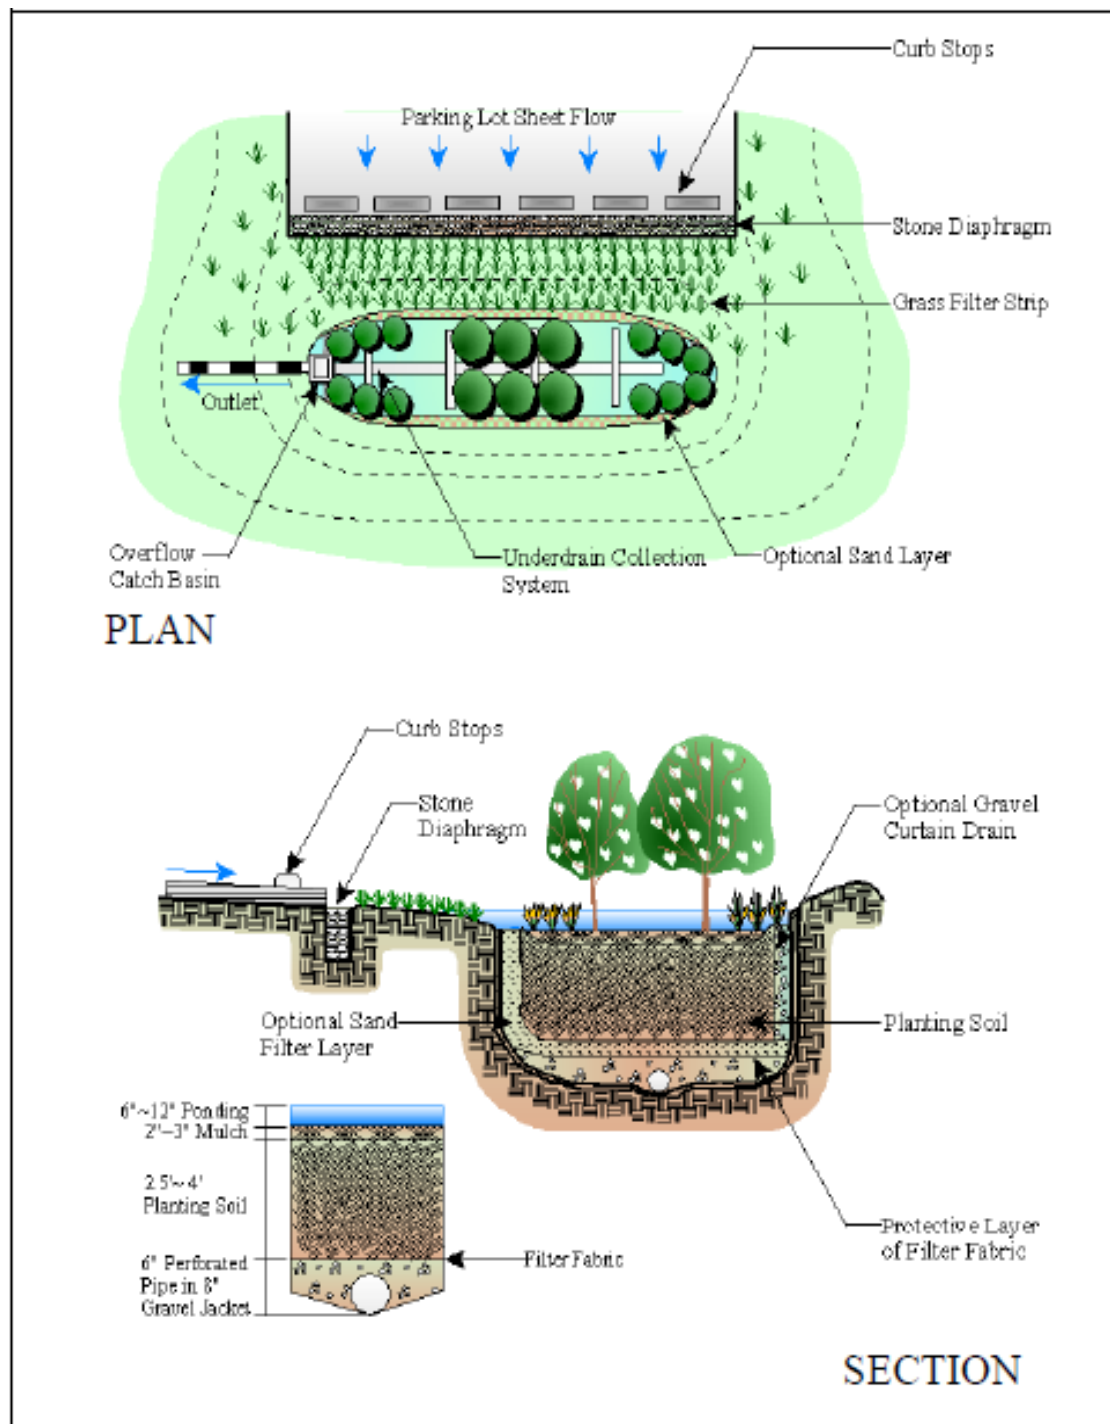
Bioretention facility plan and section view (Landphair et al 2000)
